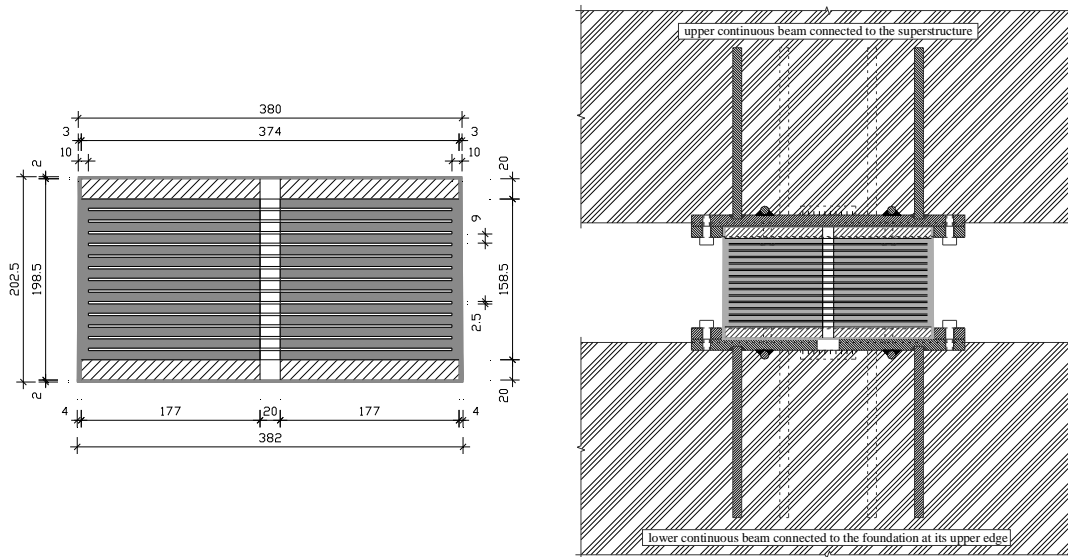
Geometrical dimensions of the designed HDRB for existing 5-story stone apartment building and location of HDRB by upper and lower recesses provided by annular steel rings bolted to the outer steel plates connected to reinforcement in the upper continuous and lower foundation beams
